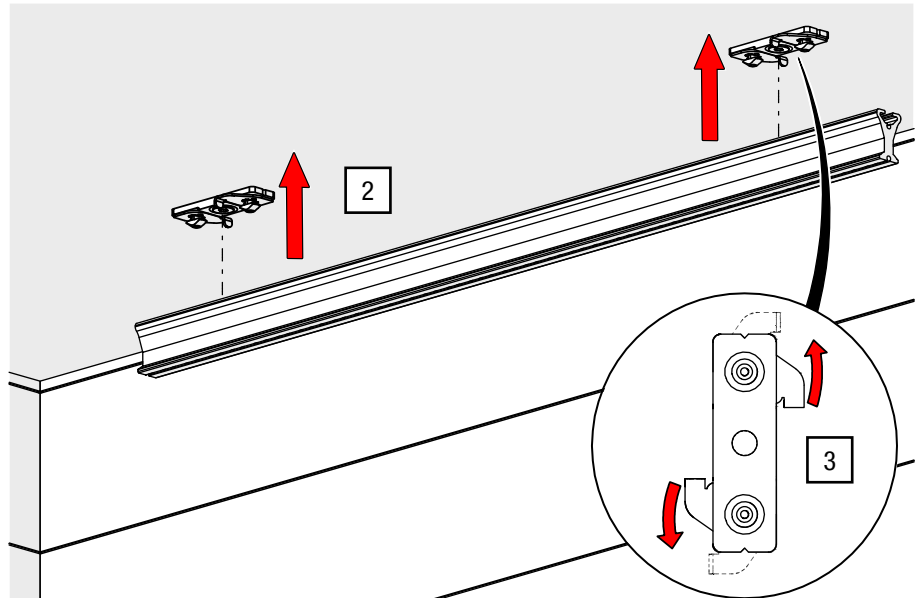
Ceiling installation – Attach track to ceiling mount bracket
